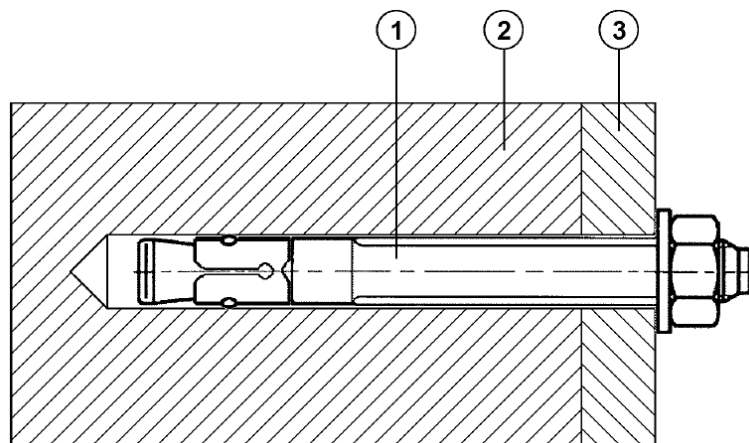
Fastening made with use of a TT-THROUGH BOLT steel expansion fastener of TT, TT-G and TT-SS versions
